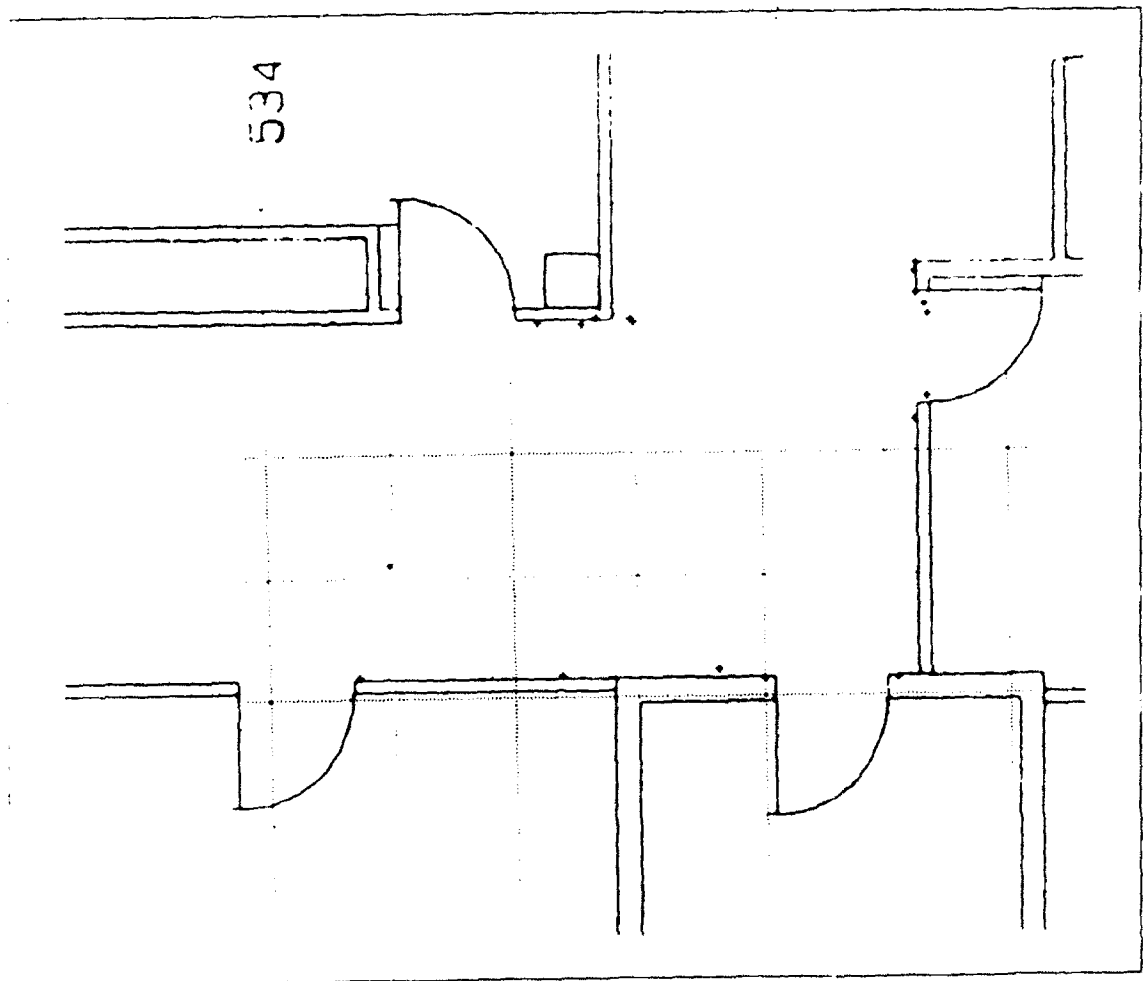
The reconstructed vertical edges overlaid on the floor plan
